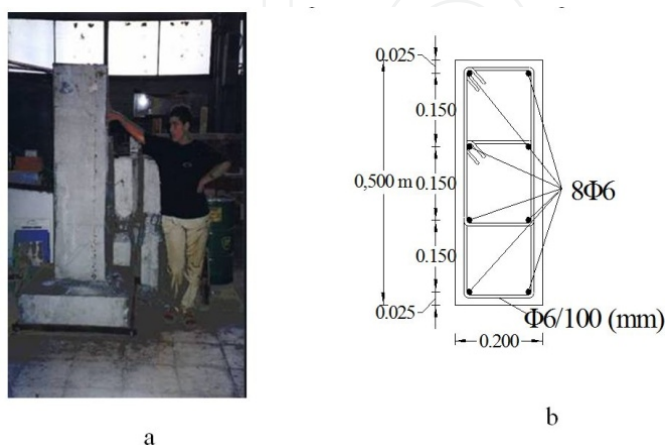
a. Pier A. b. Cross-section and reinforcing details of Pier A.
